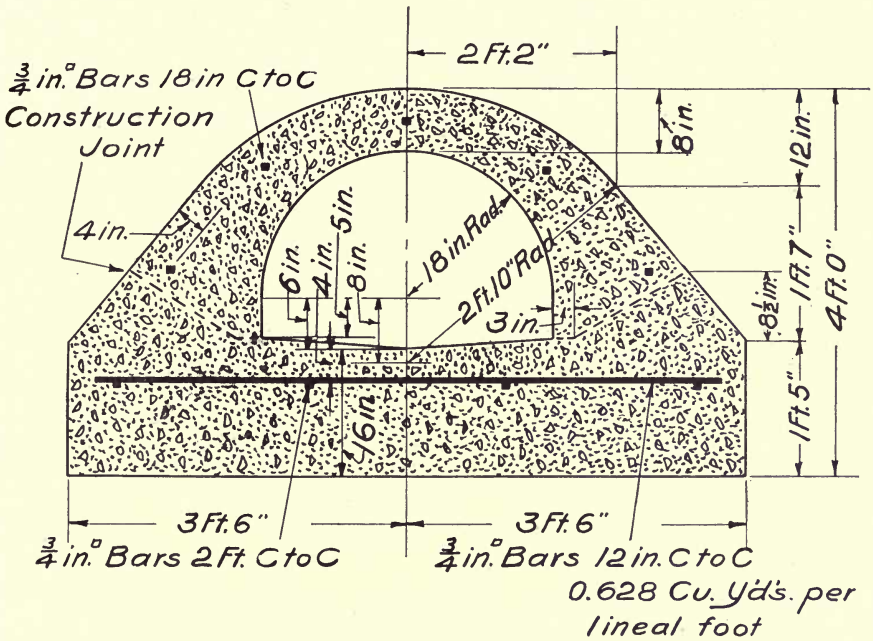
CROSS SECTION, 3-FOOT CULVERT, D., L. & W. R. R.
